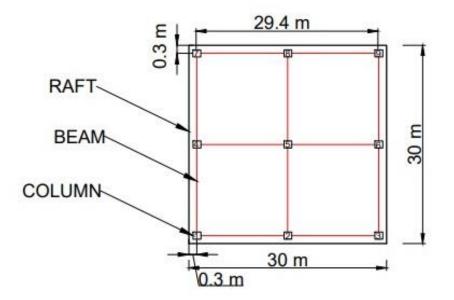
Building Plan Showing Arrangement of Beams and Columns
